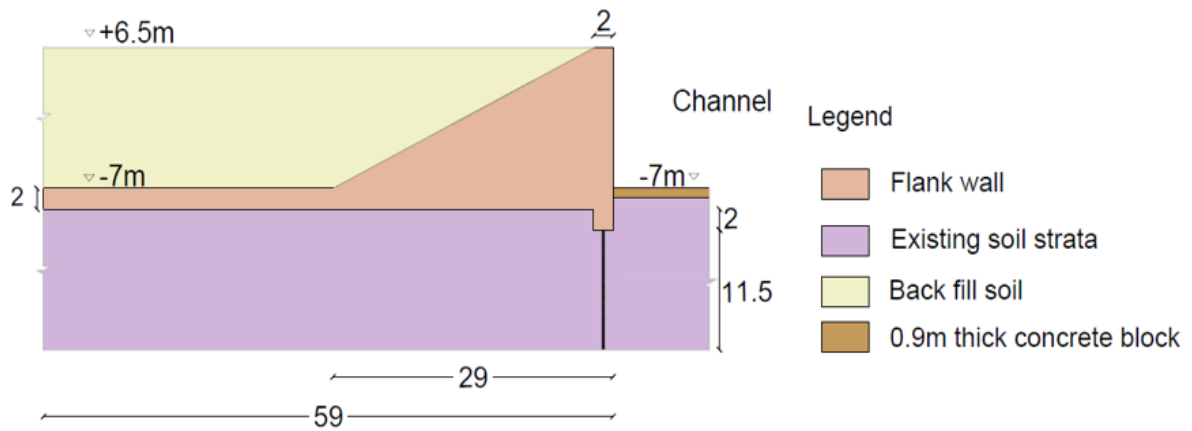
Cross Section of Upstream Vertical Flank Wall
